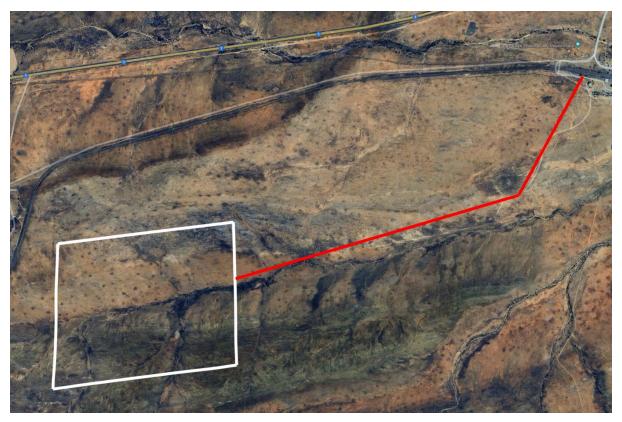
Overall Site Plan Layout with Proposed Gravel Road and Site Boundary
